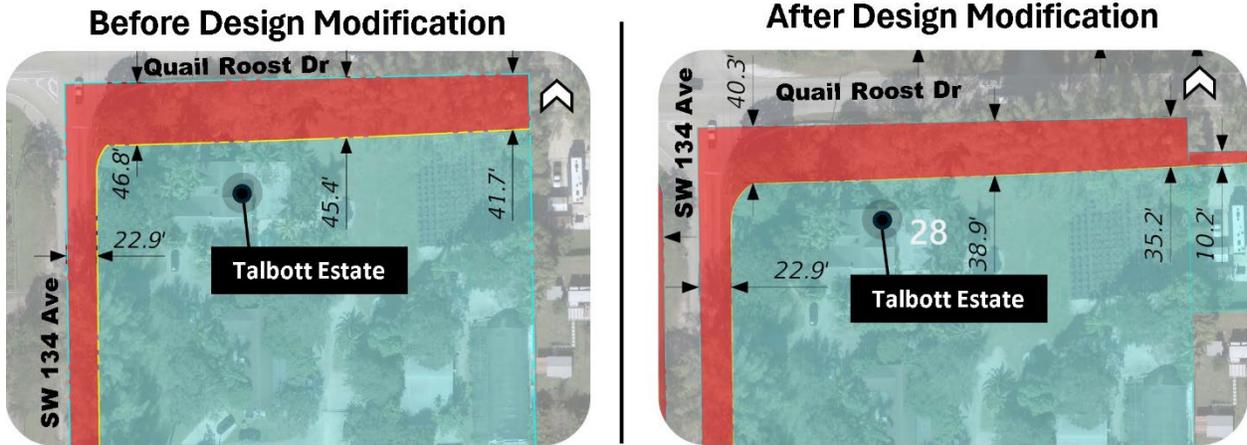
Build Alternative 3 Impact Minimization at SW 134th Avenue Intersection
